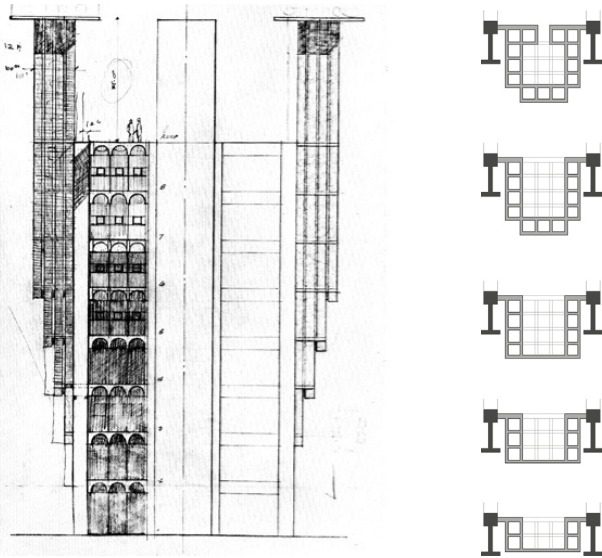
Early Elevation and Exhaust Shaft Floor Plan of the MRL
